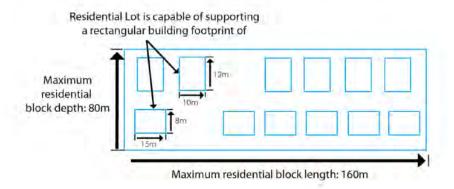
Figure CA: Residential Block Dimensions and Rectangular Building Footprint
